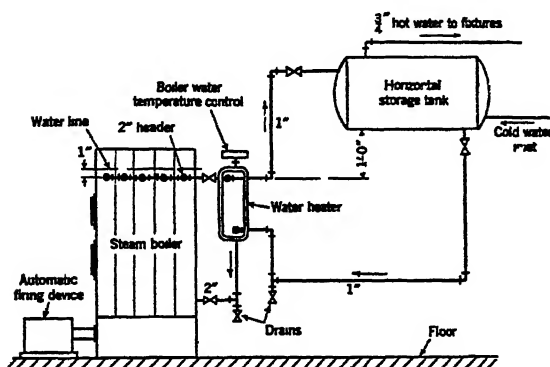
INDIRECT WATER HEATER MOUNTED ON SIDE OF BOILER
